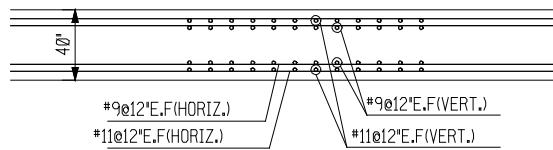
Typical Reinforcement in South Interior Wall – SECTION 2
